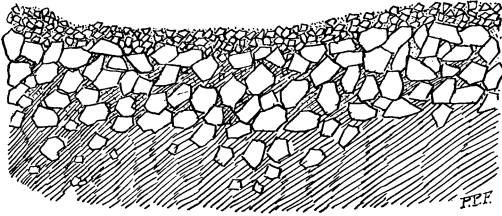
Cross section of macadam road showing result of placing stone on loose or wet earth foundation.
